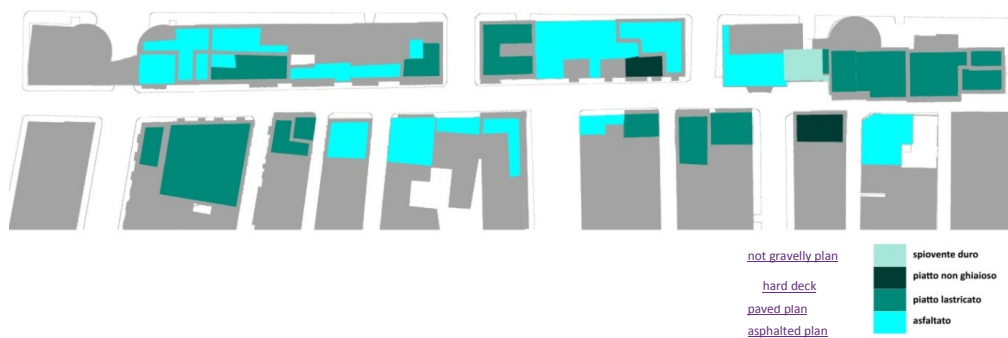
Roofing plan of Via Sopramuro buildings. Evaluation of feasibility of the collector system.
